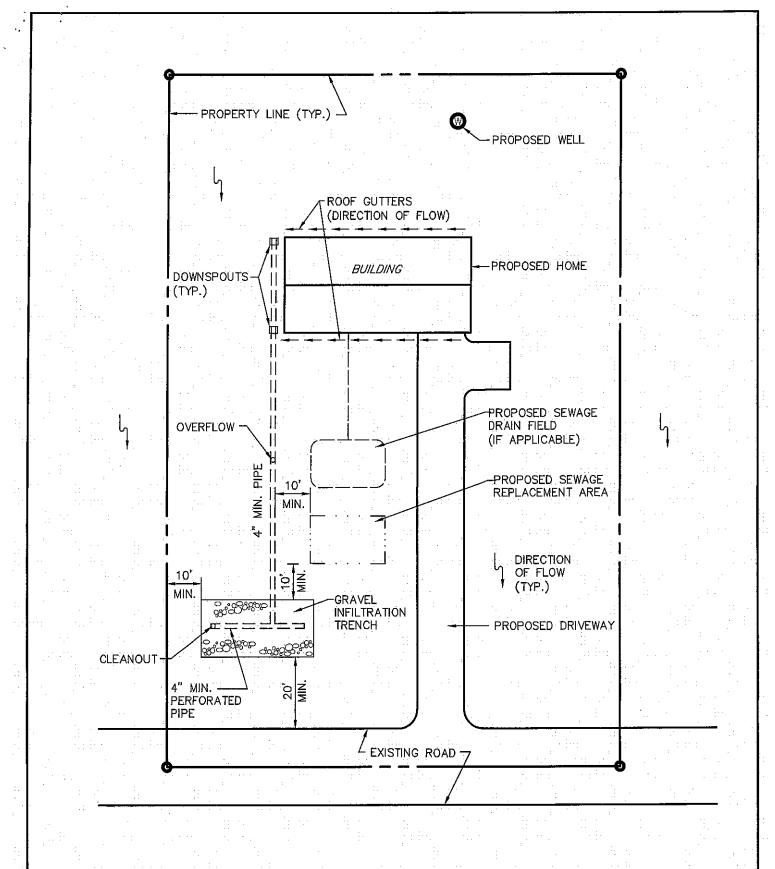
EXHIBIT A TYPICAL INFILTRATION TRENCH PLAN
